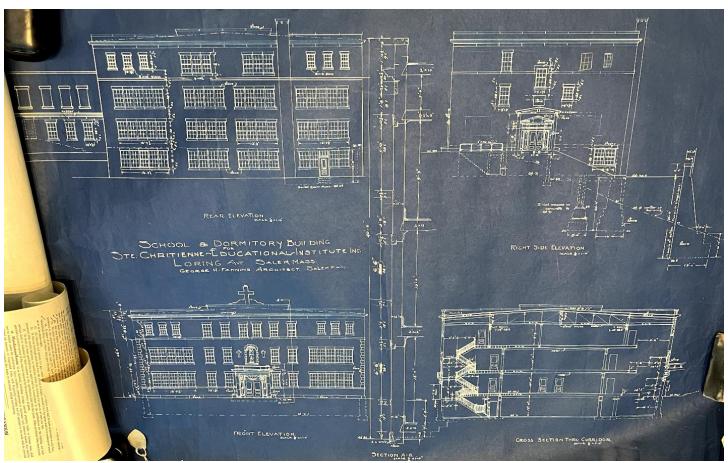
1948 elevation and section drawings for the addition to the Sainte Chrétienne Academy. Source: Massachusetts Archives, Division of Inspection, Building Inspection Plans.
